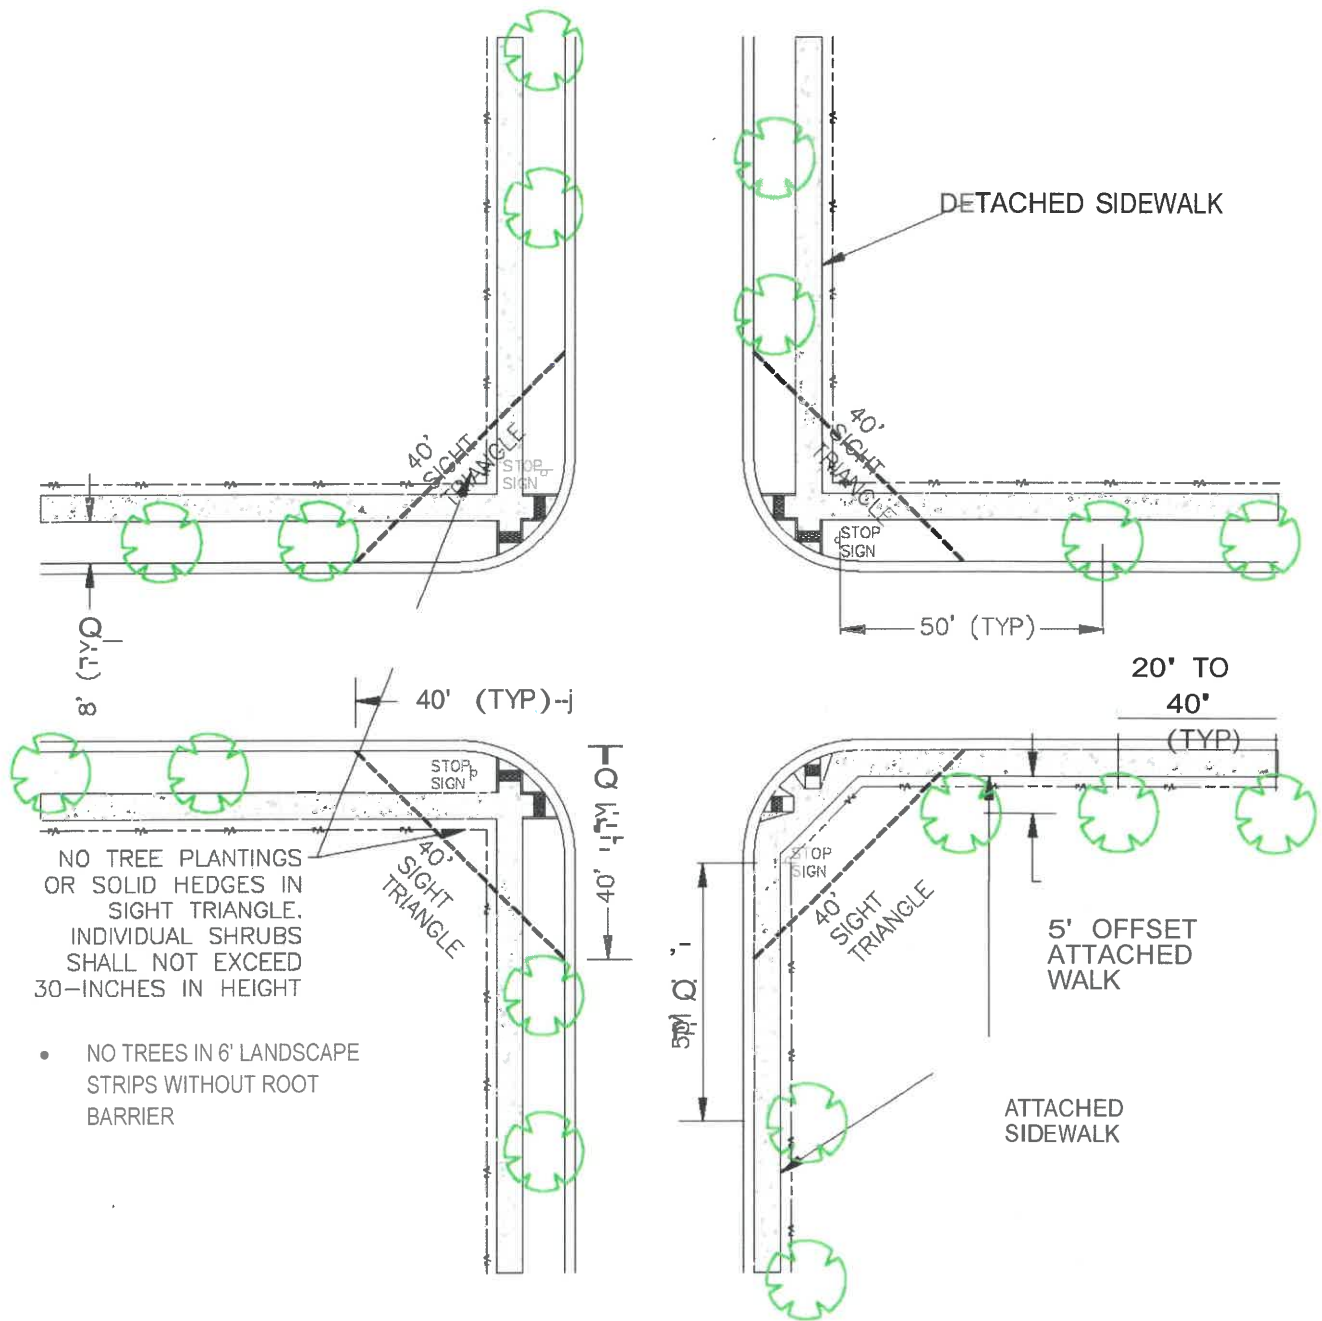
CLASS II TREE PLANTING DETAIL: 8' PLANTER STRIP
